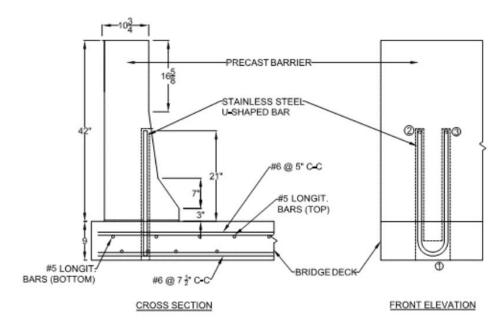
Iowa State University U-bar Connection Between Precast Barrier and Deck (all dimensions are in inches) [1]
